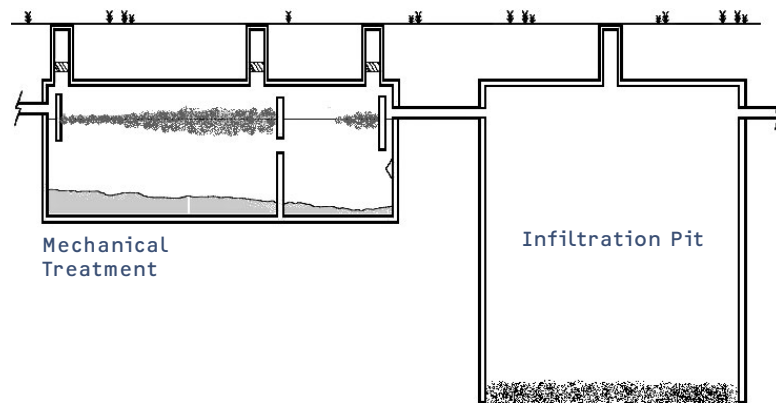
Stormwater treatment (p2m berlin GmbH)
